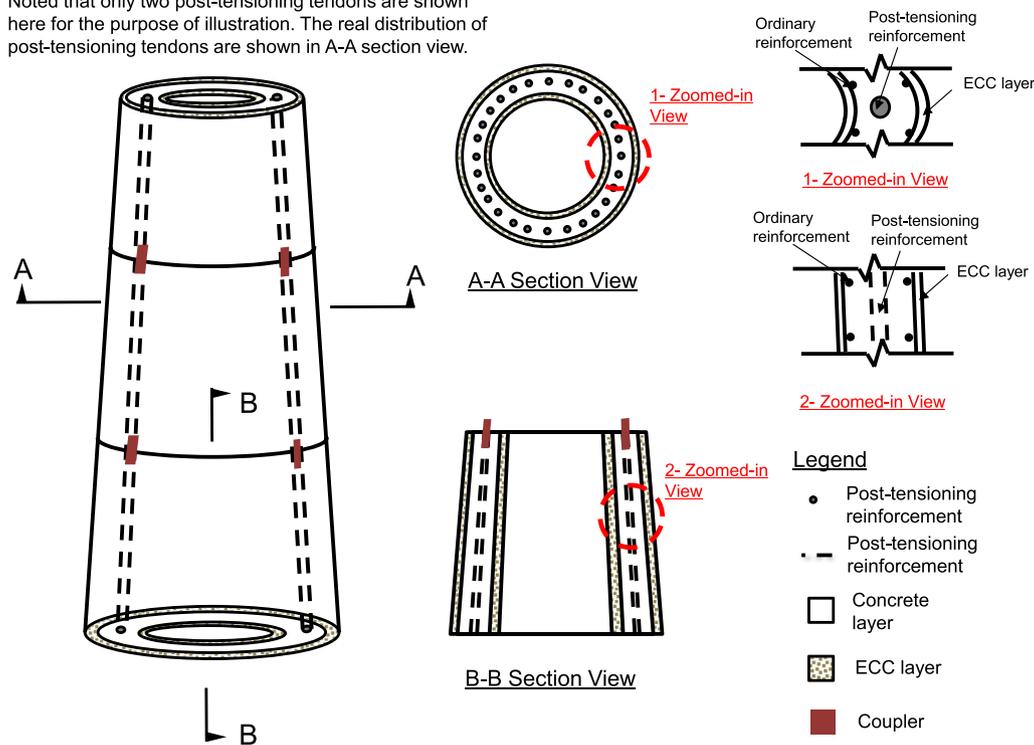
Schematic design of tall hybrid ECC/concrete wind towers.
